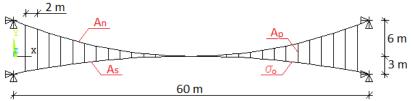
Numerical model of prestressed cable trusses of pedestrian suspension bridge
